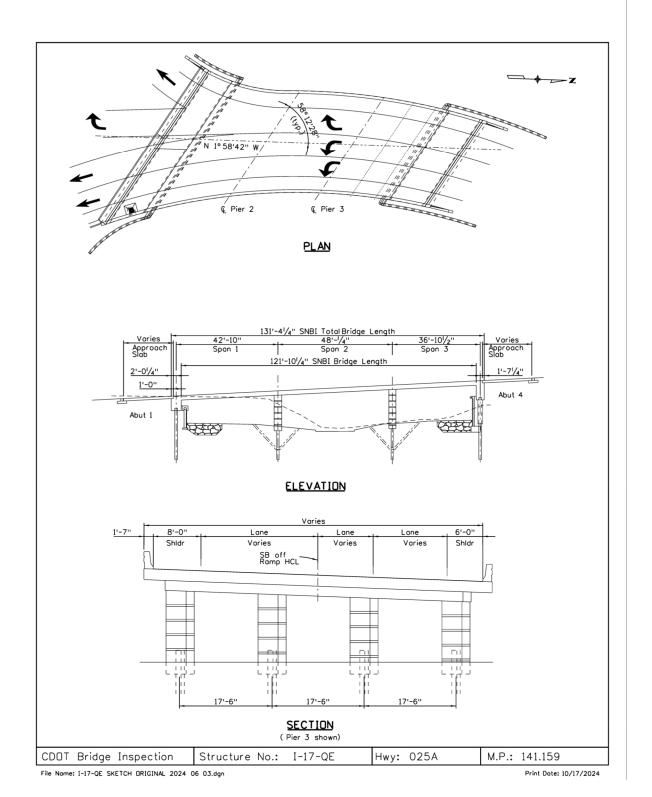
Bridge Inspection Sketch – Example 10
